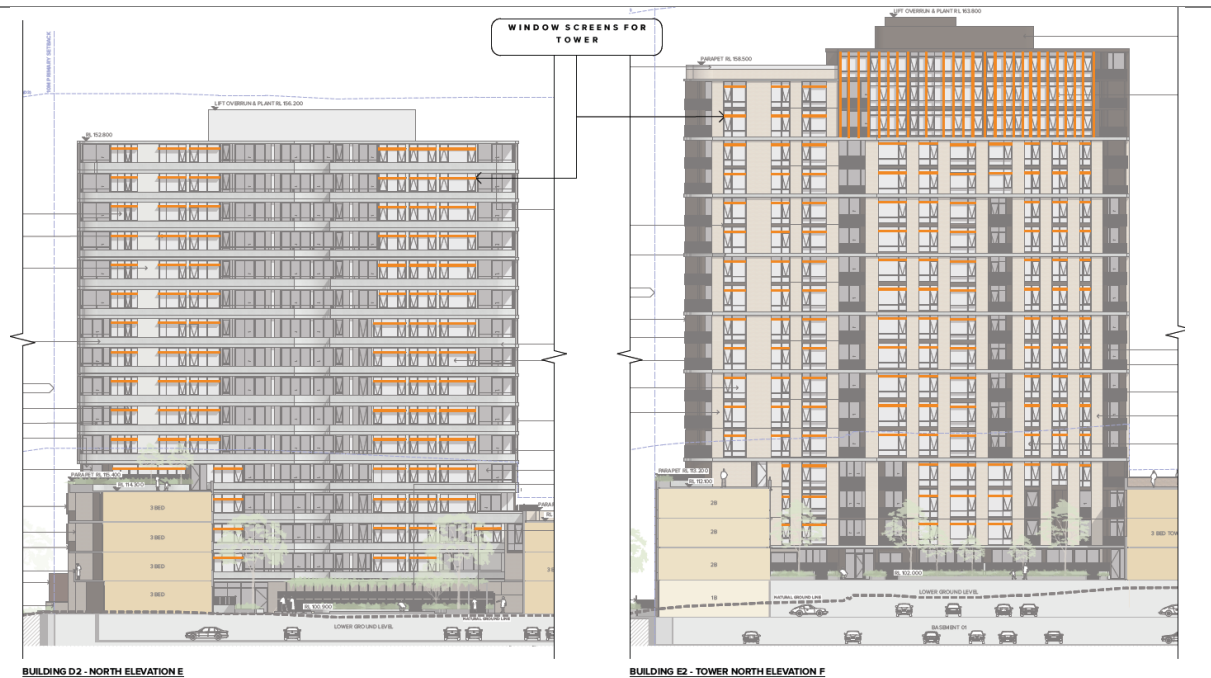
Window screens for solar shading located on Building D2 (left) and Building E2 (right) north elevation (Source: Turner Studio)
